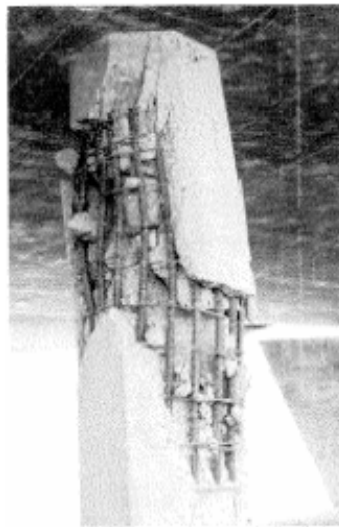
Foothill Freeway Column Failure [2]
